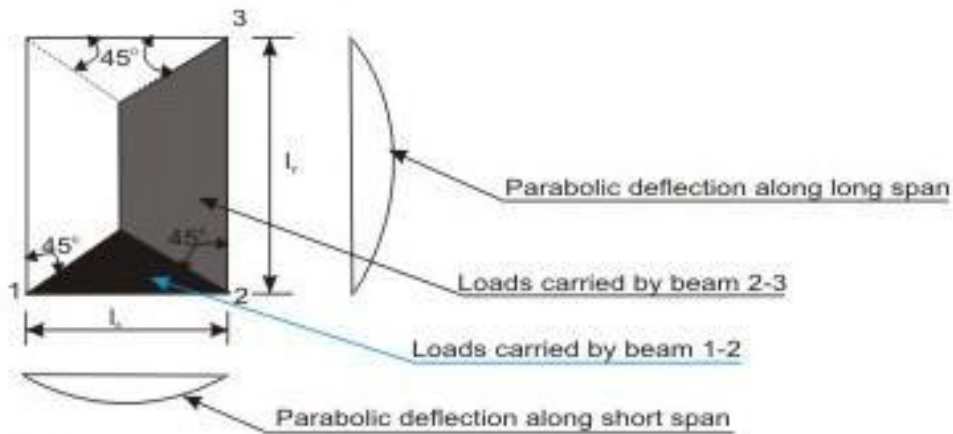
(b): Two-way slab ($l_y/l_x \leq 2$)
